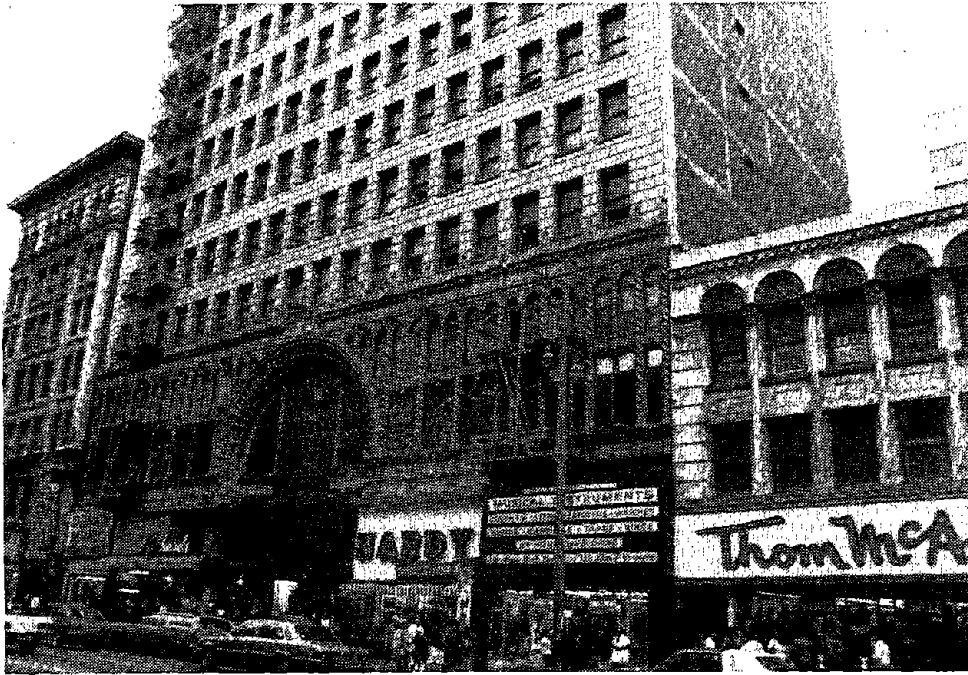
URM BUILDING WITH VISIBLE STRUCTURAL FRAME
